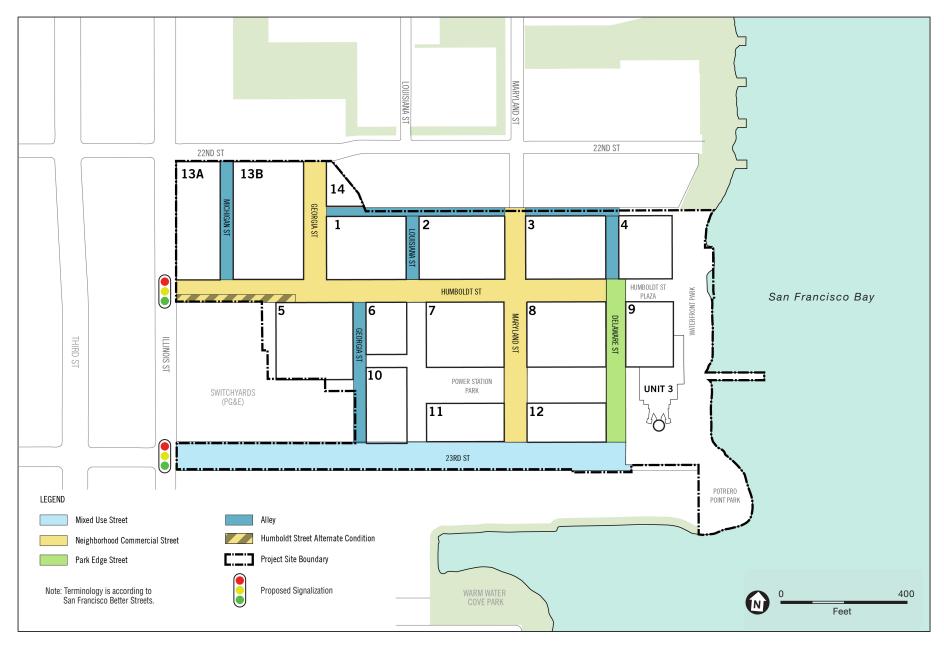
shows the proposed street plan. The north-south streets include Michigan, Georgia, Maryland, and Delaware Streets, which would connect the project site to 22nd Street; Georgia, Maryland, and Delaware Streets would connect to 23rd Street, although Georgia Street would be slightly offset at Humboldt Street before connecting to 23rd Street. East-west streets include Humboldt and 23rd Streets, which would connect
